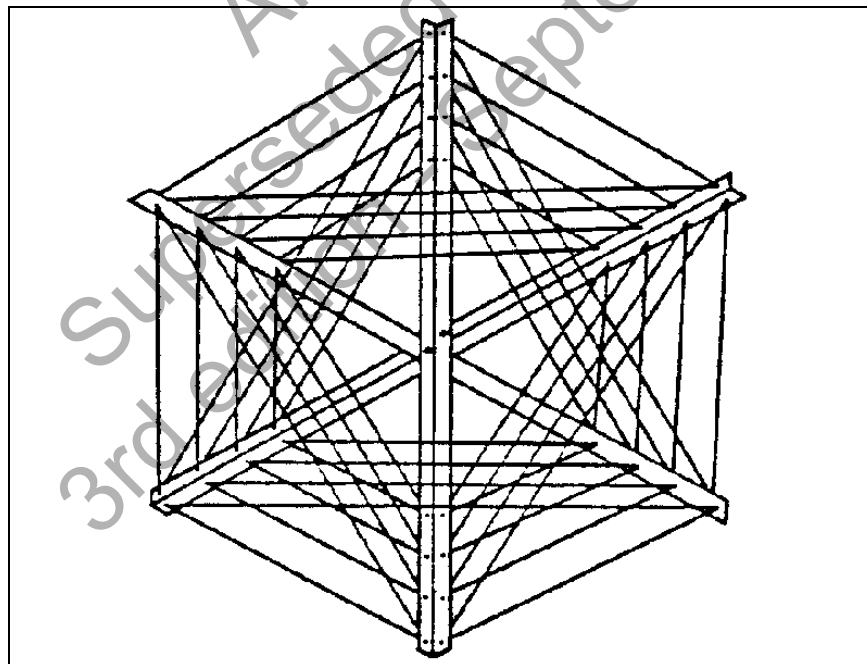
Typical jack unit (after Brown).⁽²⁾
